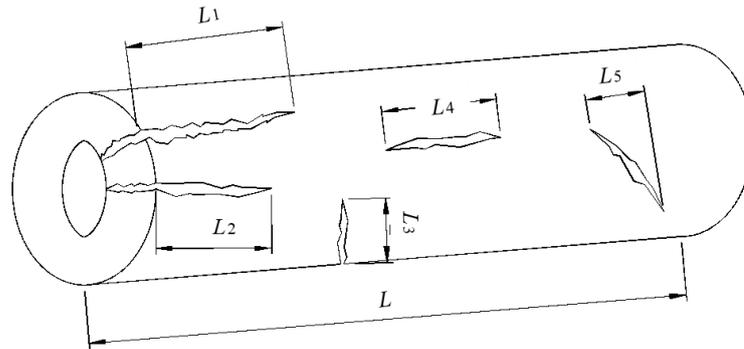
Damage measurement (Cylindrical fender- Tear, Crack and Burn)
